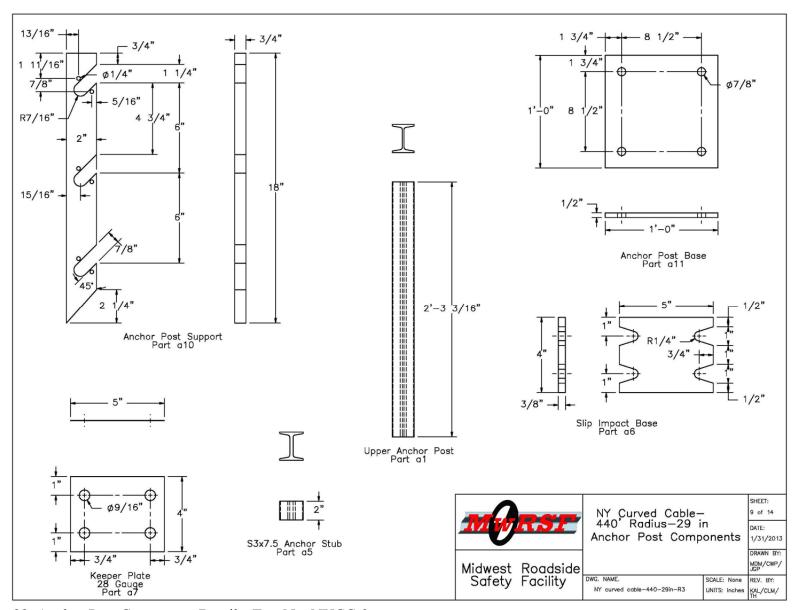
Anchor Post Component Details, Test No. NYCC-3
